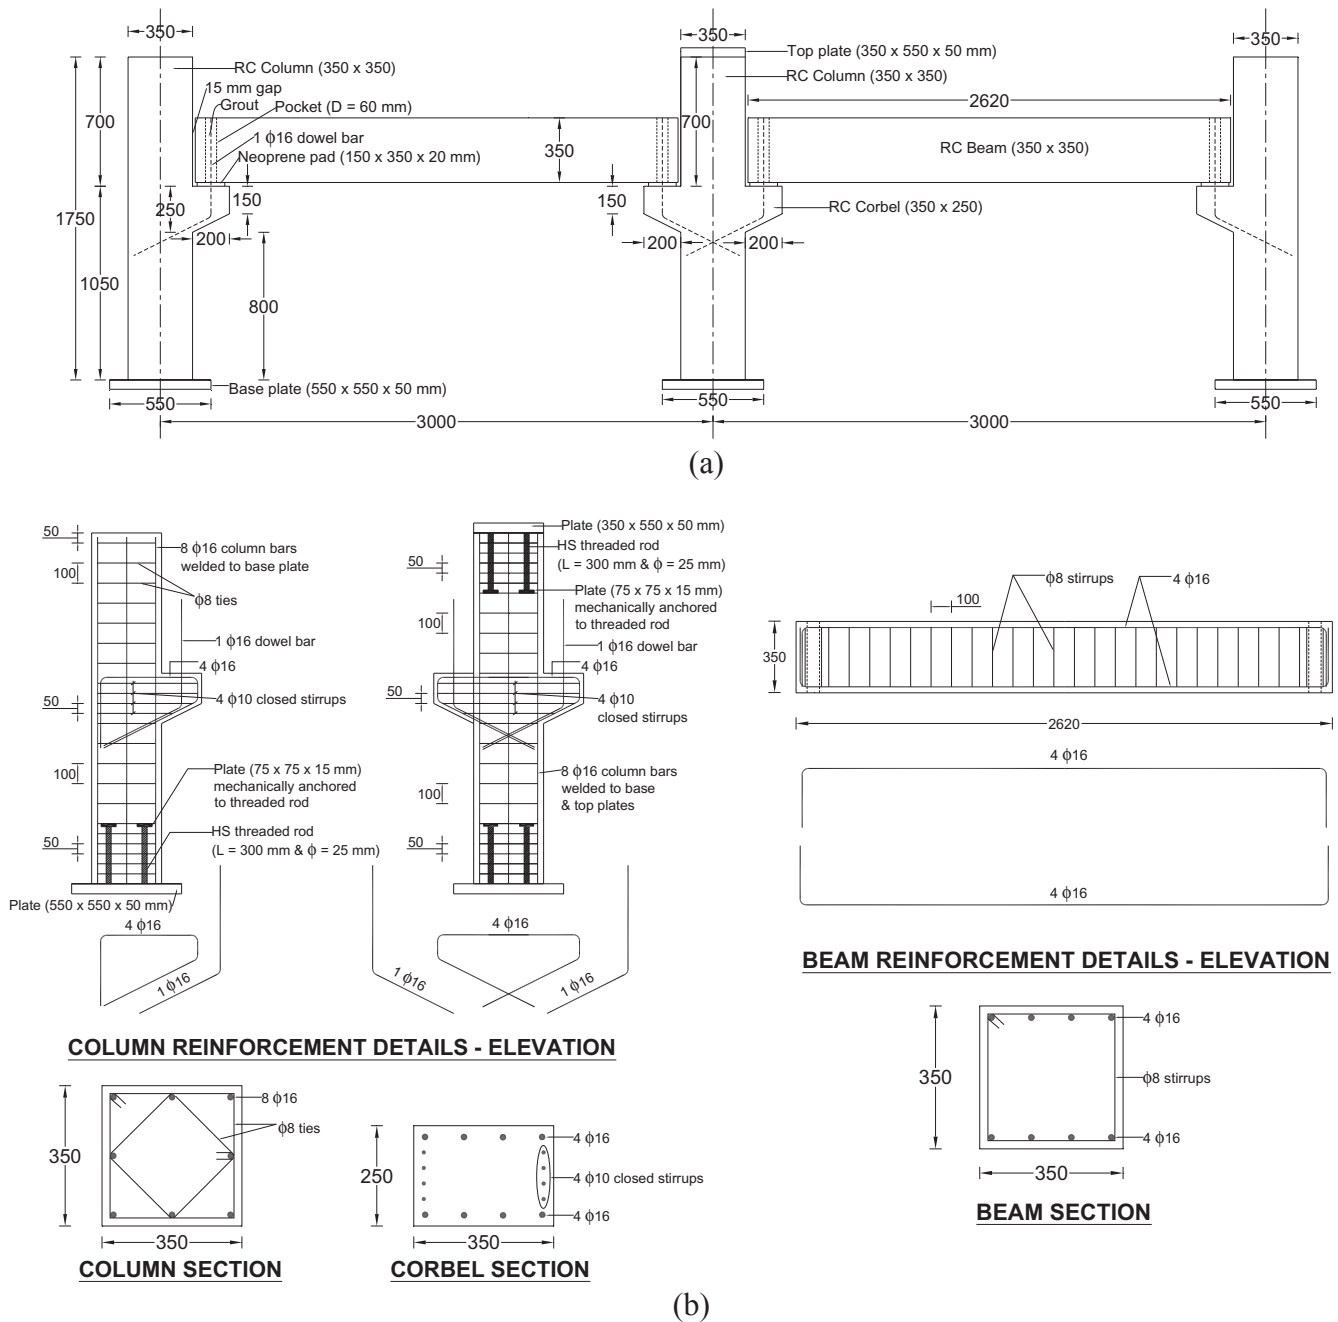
Details of precast specimen PC-C (Note: All dimensions are in mm): (a) Test specimen; (b) Reinforcement details.
